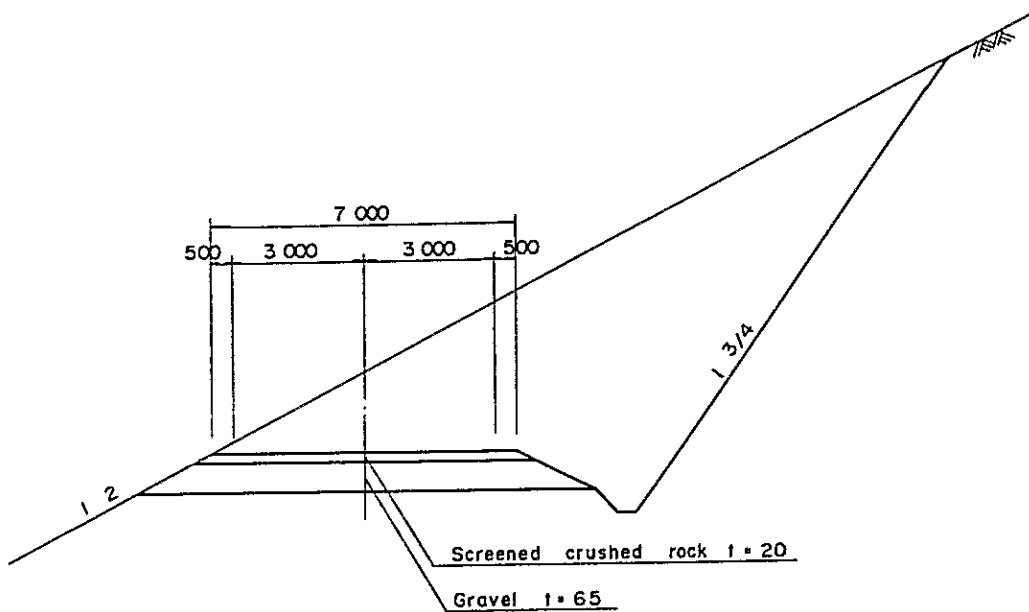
Typical Cross-Section of Llano Grande/Coclesito Section (Gravel Proposal)
